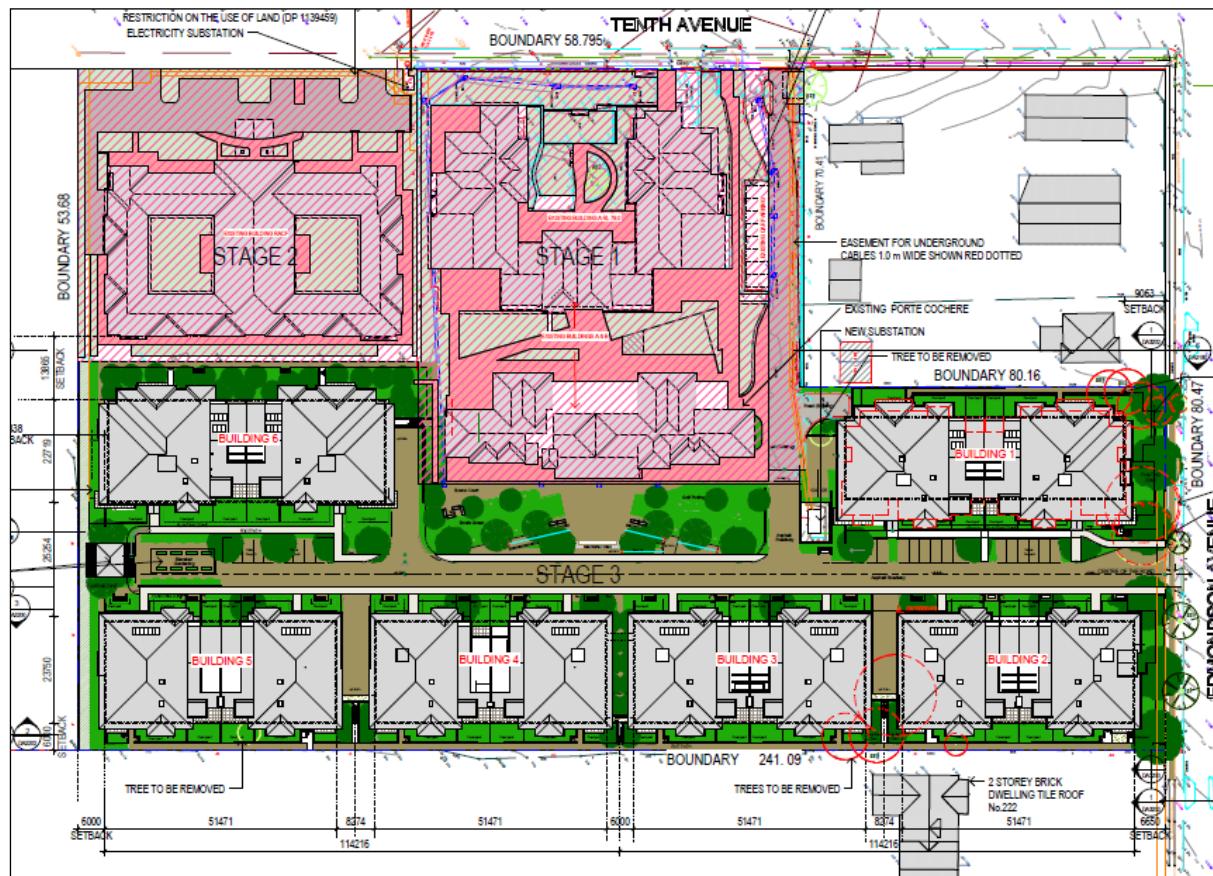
Extract of the proposed site plan provided under DA-620/2016.
